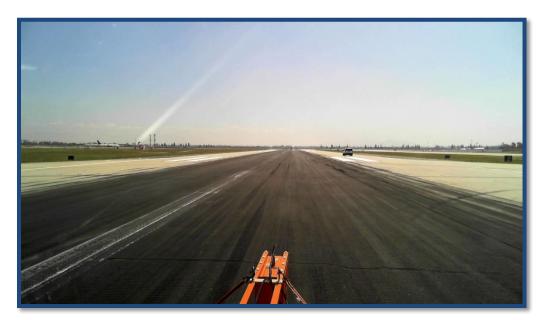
Runway 8R-26L Representative Pavement Condition (Sta. 23+00)
